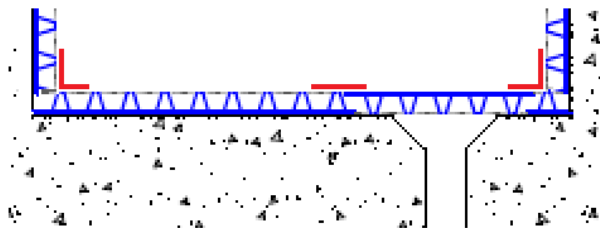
Tape any geotextile joints to prevent ingress of soil and place wall sections directly onto the base layer
